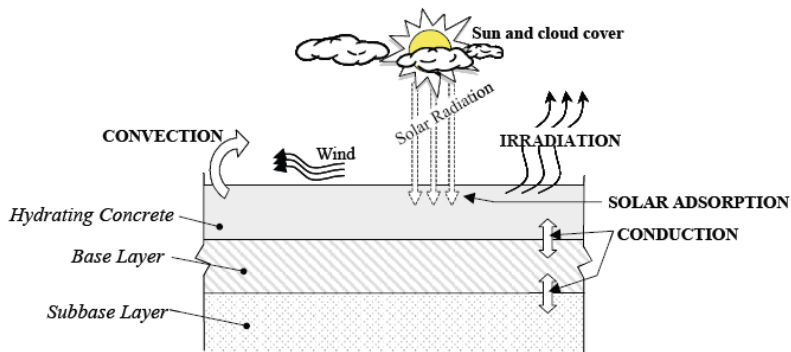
Heat transfer mechanisms between pavement and its surroundings (Ruiz, Rasmussen et al. 2006).
